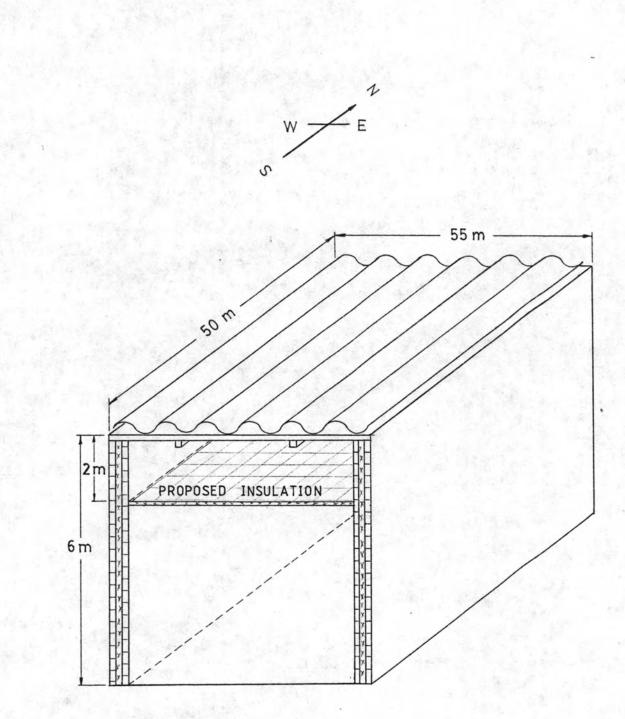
The Draw-Twisting Building with Proposed Insulation.
